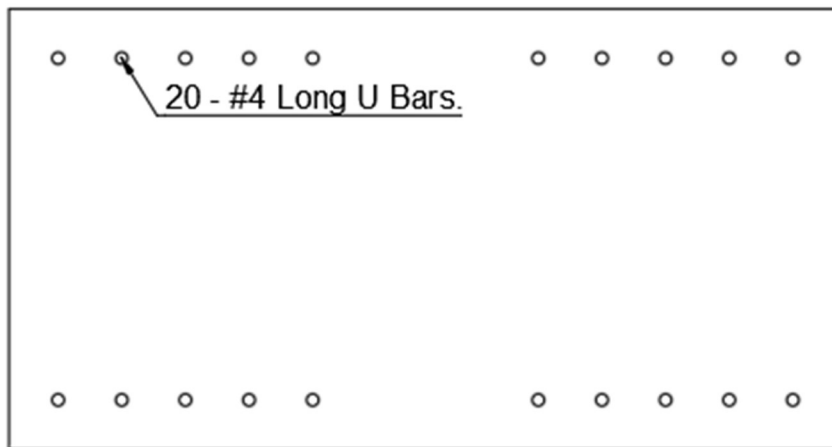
Footing cross-section E-E, at hinge-to-footing joint
